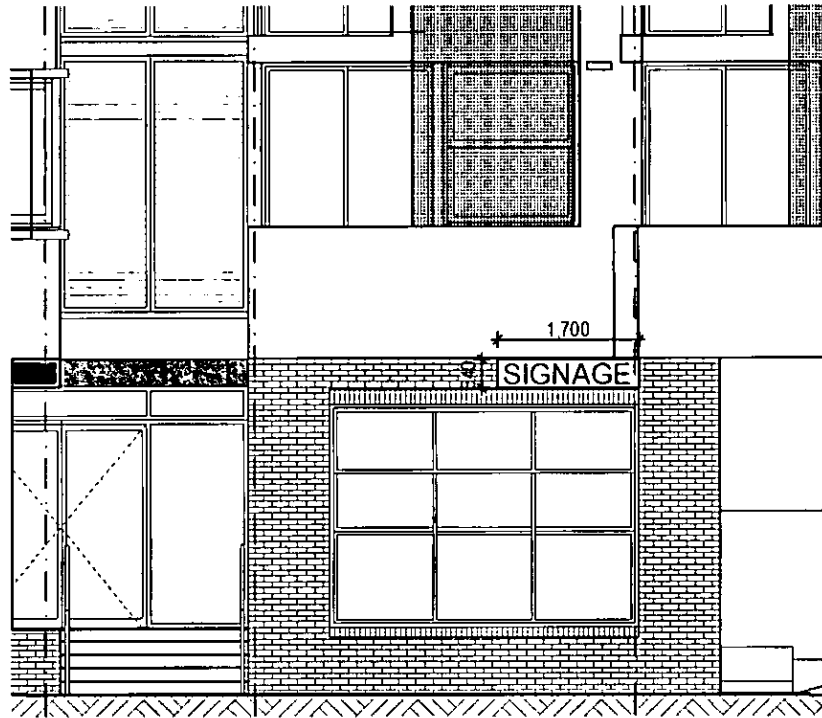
Retail (Lot 67) Elevation, Location and Size Plan
